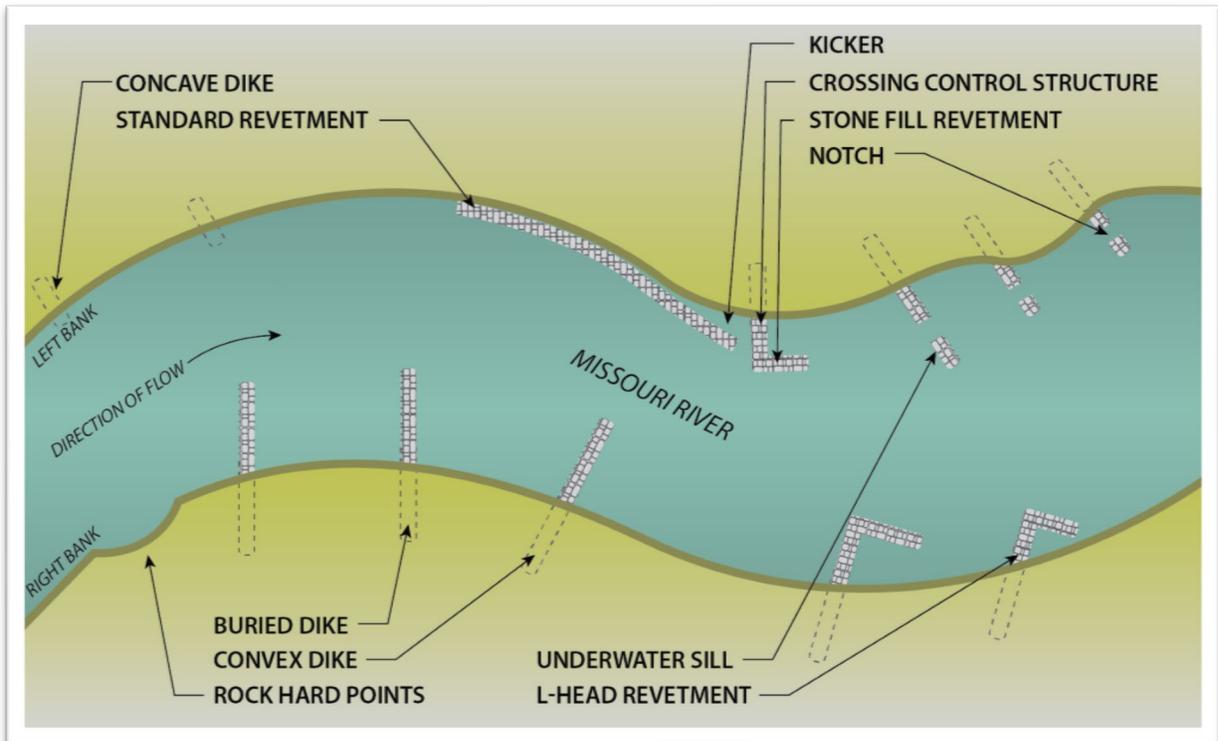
Typical Arrangement of BSNP Structures on the Missouri River
